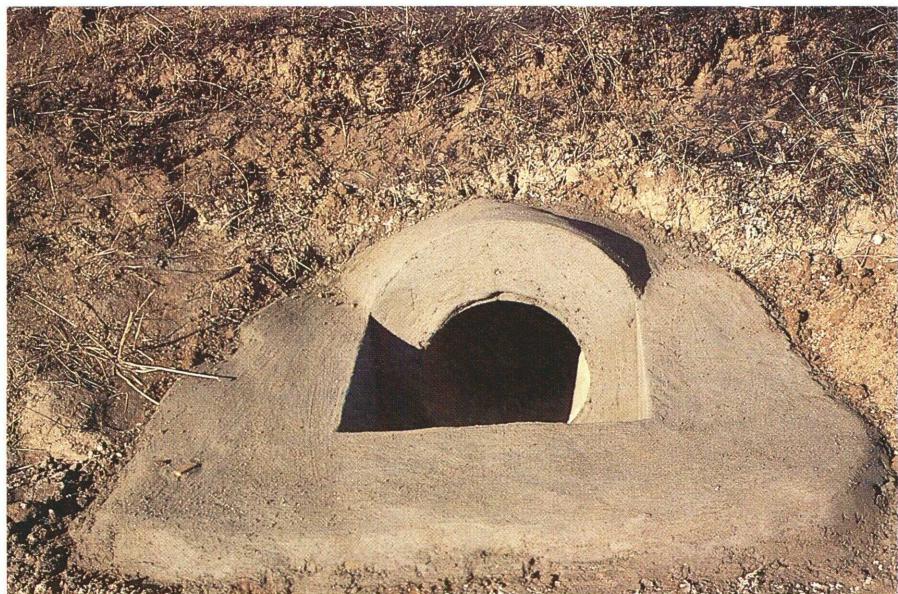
Small erosion control structure at outlet end of 16-inch concrete pipe through which water flows from supply ditch to basin. Maximum flow rates expected through turnout would be 3 to 4 cubic feet per second.
